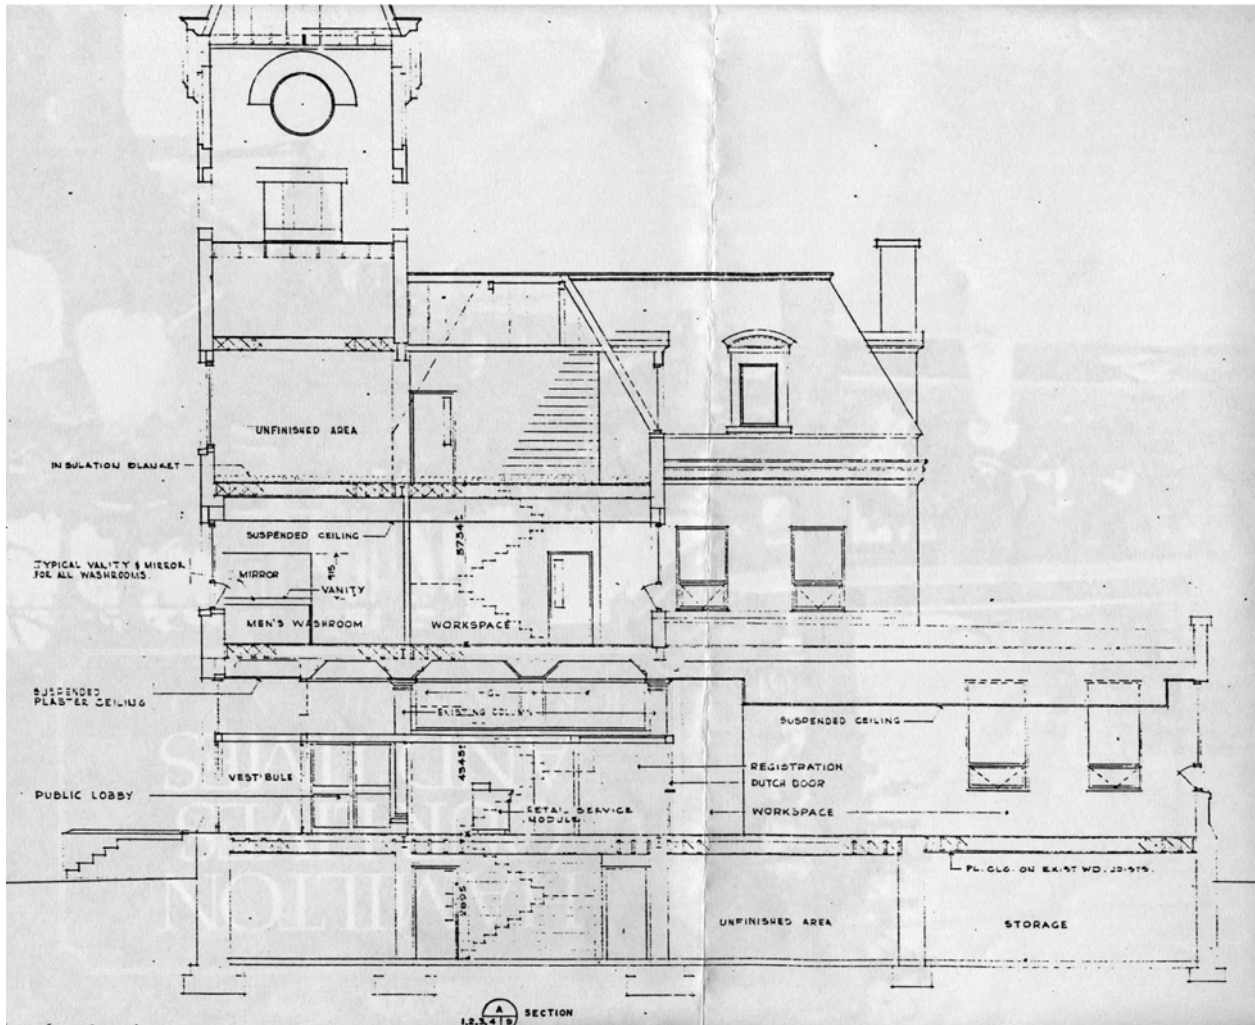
Drawing No. A9: North-south section from the 1978 set of drawings for proposed renovations and additions, looking east. Section through the one-storey rear extension and the registration room, showing the profile of the new counter identified as a Retail Service Module with the new east-facing doors from the Public Lobby to the ramp on the east wall of the frontispiece to the left. Also shows the suspended ceilings to be installed in some areas of the first floor and throughout the second floor as well as the interior wall of the basement which was the original rear wall of the building before the pre-1949 extension was built.
